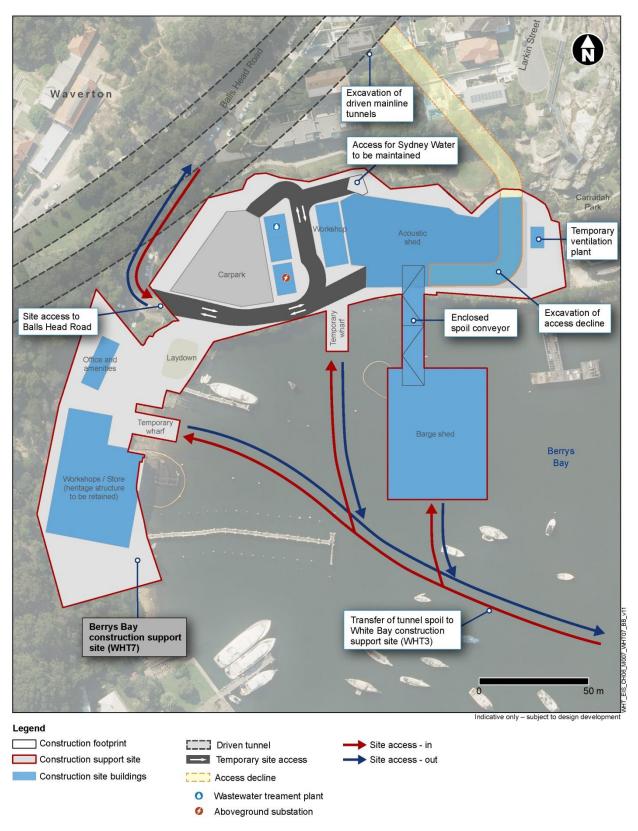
Construction activities associated with Berrys Bay construction support site (WHT7)
